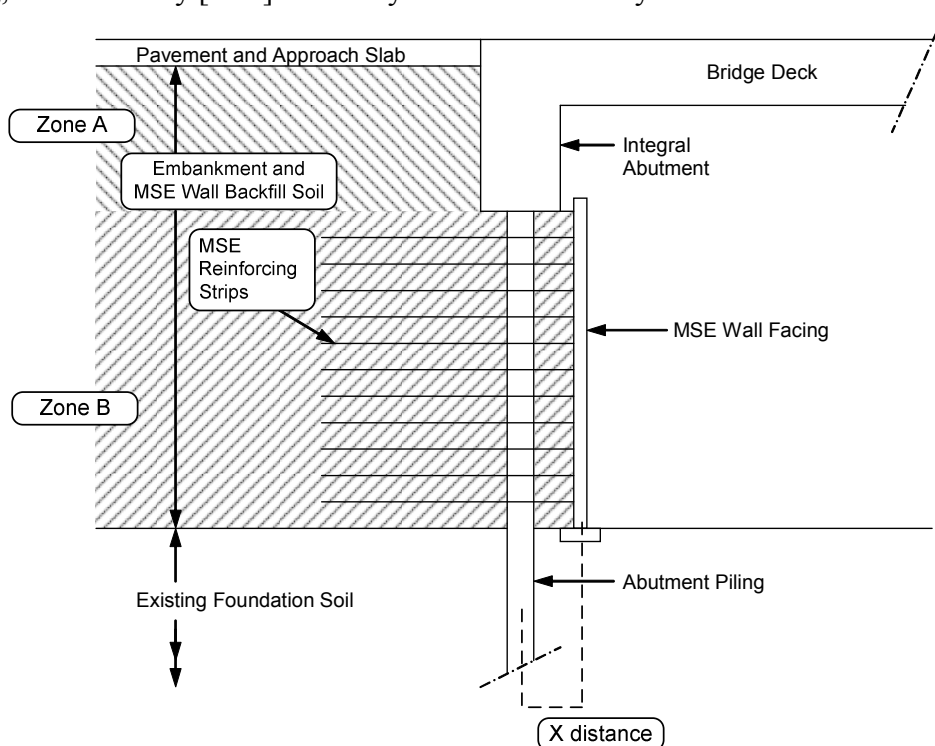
Profile View of Integral Abutment Bridge and MSE wall
